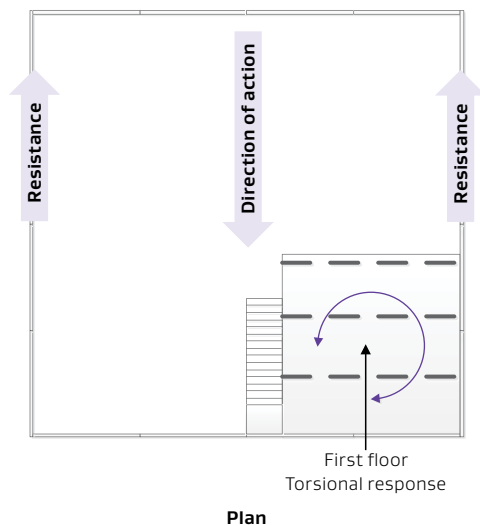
(a): Schematic plan layout of example building 1 featuring an incomplete load path
